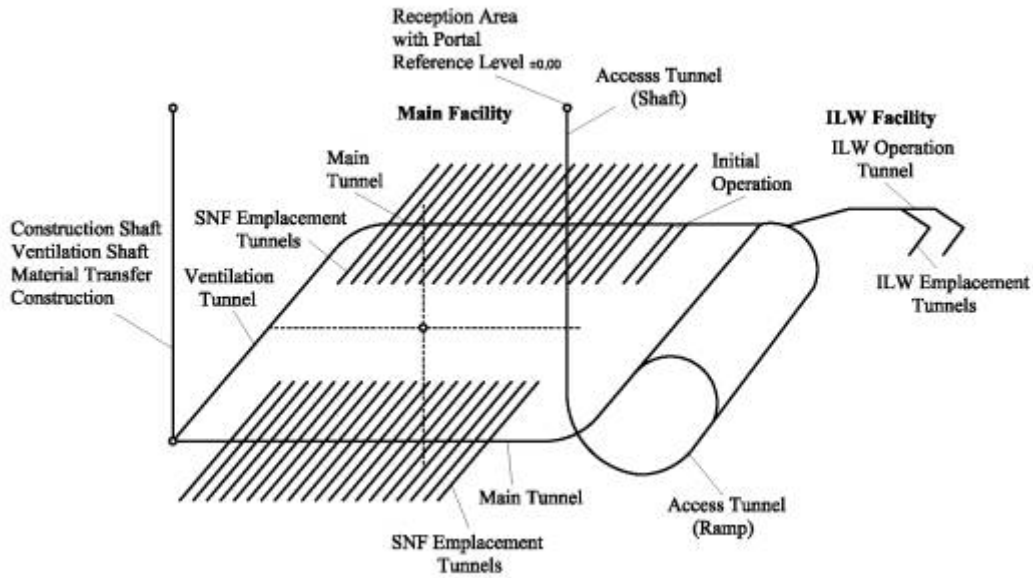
Plan view of the repository for RBMK-1500 SNF disposal of in crystalline rocks
